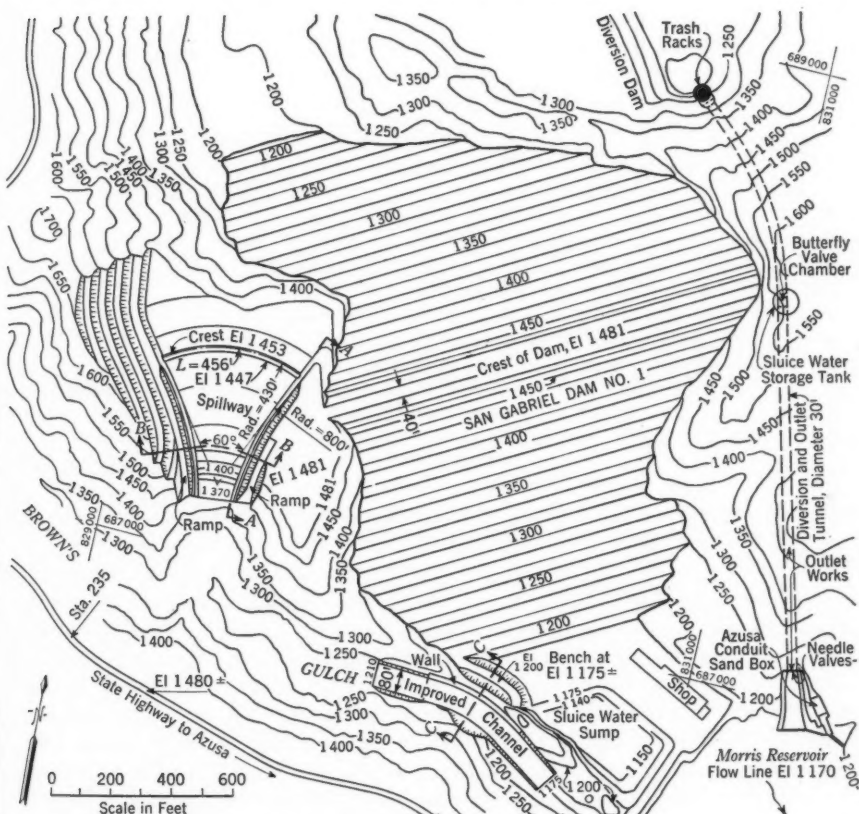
PLAN VIEW, SAN GABRIEL DAM NO. 1
